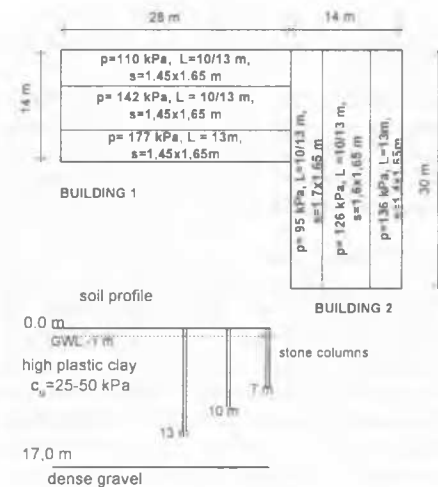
Foundation raft top view with distribution of loading, indication of column spacing and length and soil profile
